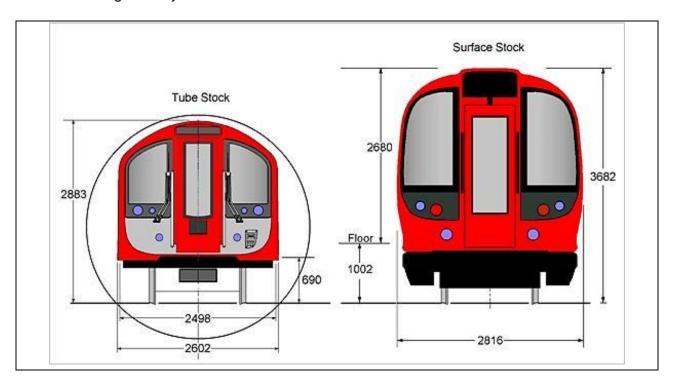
London Underground Railway Tunnel Sizes with measures in mm Source: Tubeprune (11.10.2010)
